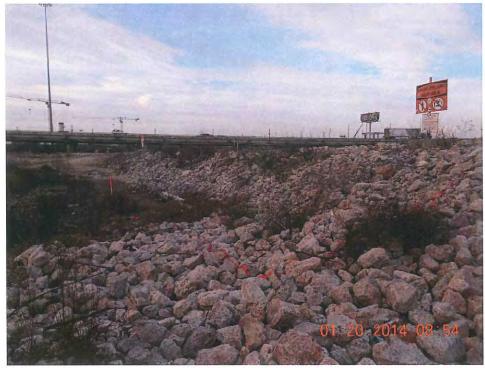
Pre-enhancement slope of Area #5 on the eastern slope of the Central Berm.
